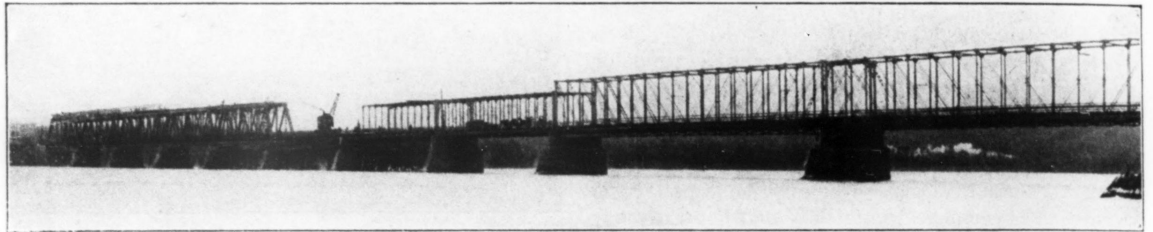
RECONSTRUCTION OF MISSISSIPPI RIVER BRIDGE AT KEOKUK, IOWA (DEC. 1, 1915)
